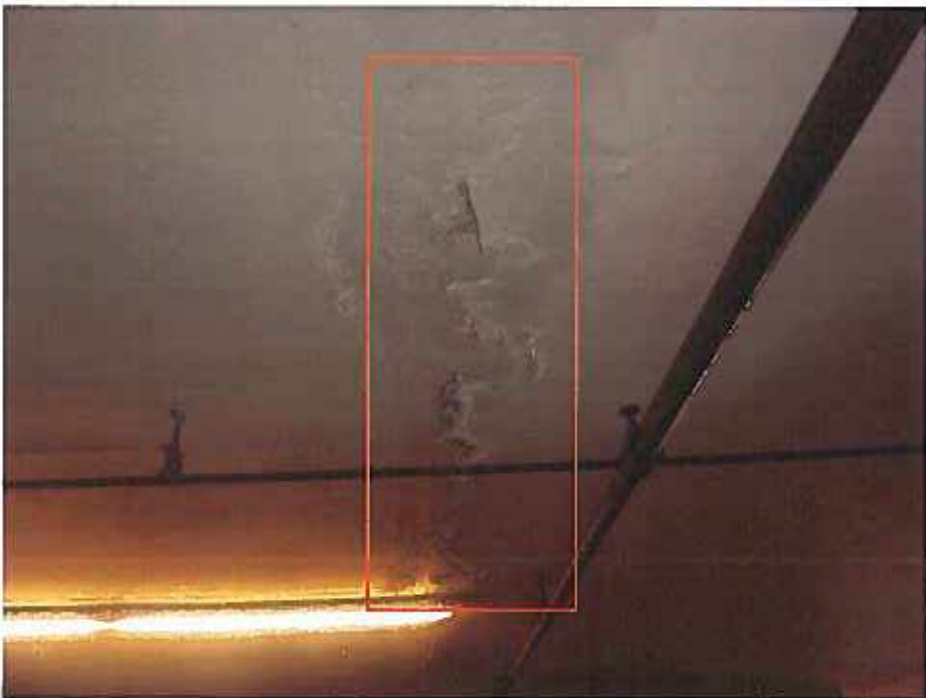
Efflorescence bloom along crack in underside of podium slab.
